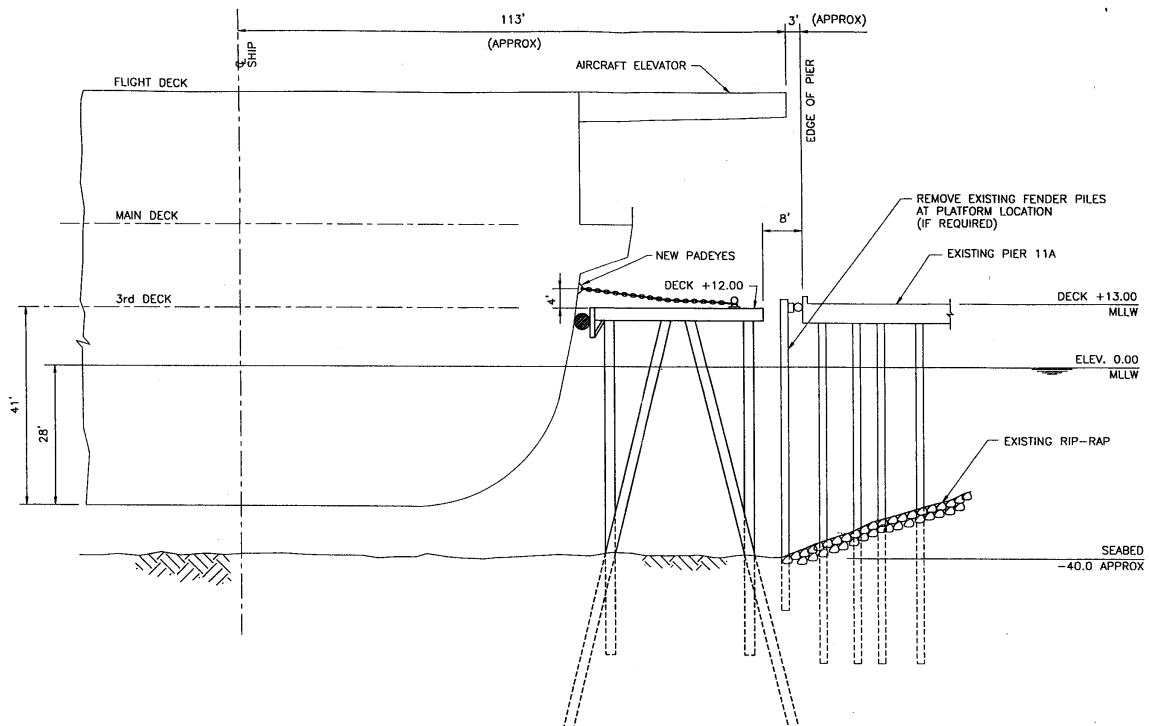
Cross section of pier improvements and Midway hull in berthed position.
